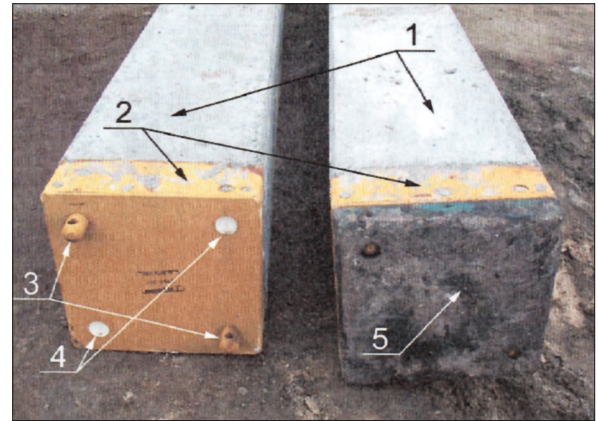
Prefabricated piles with steel joints [6]: 1 – reinforced concrete piles, 2 – steel joints, 3 – steel bolts with holes for connecting bolts, 4 – steel sleeves for pins with safety plugs, 5 – Teflon washer protecting bolts during pile driving
